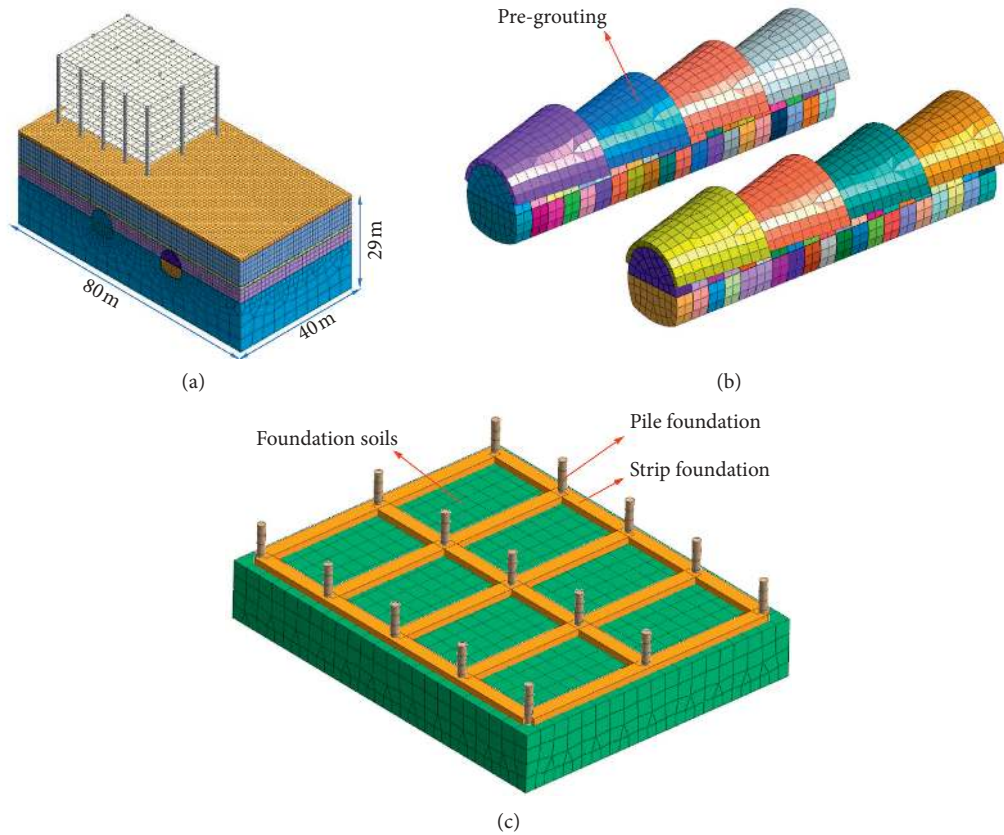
The finite element models: (a) overall model, (b) grouting model, and (c) building foundation model.
